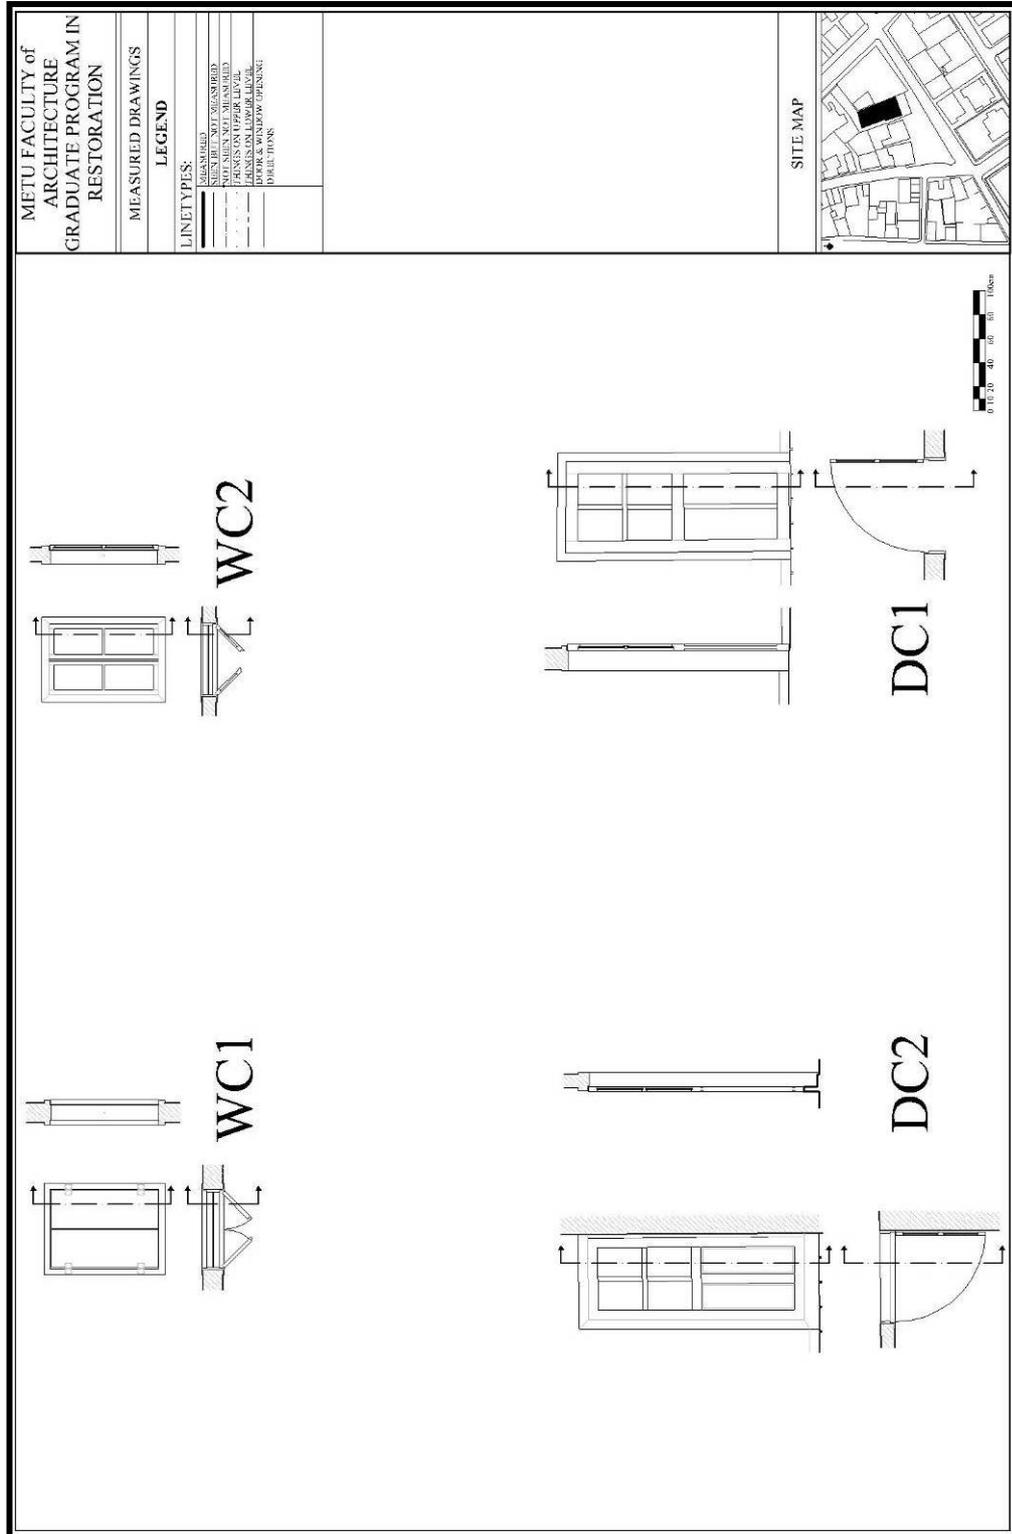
Detail Drawings; Doors & Windows of Cihannima Floor
